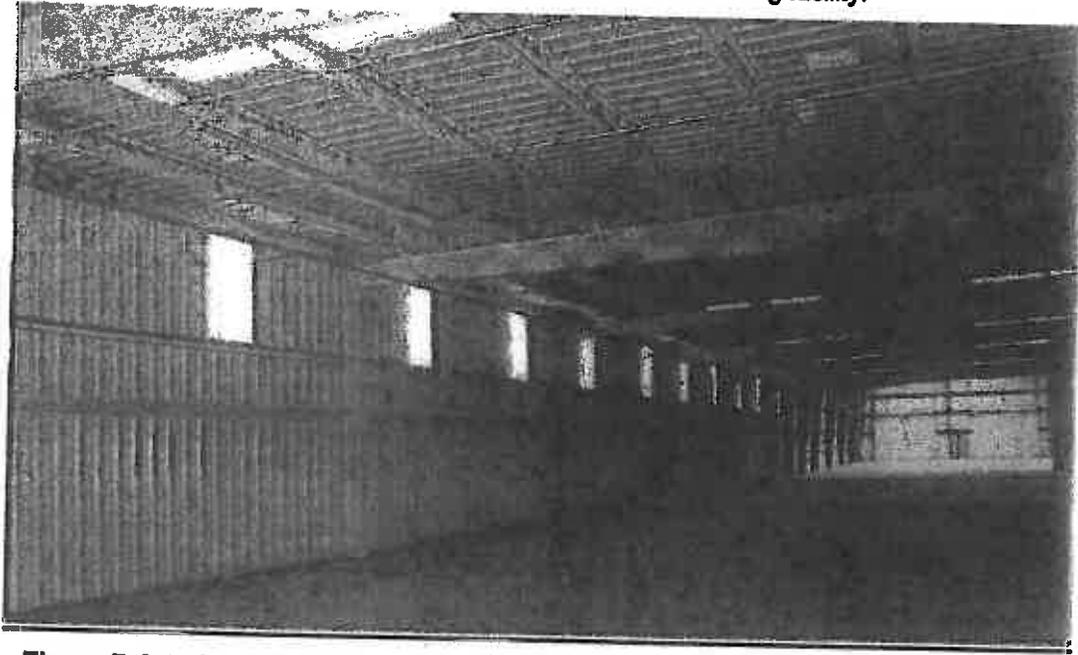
View of Rear of Building Proposed for Farmworker Housing, 218 First St.
